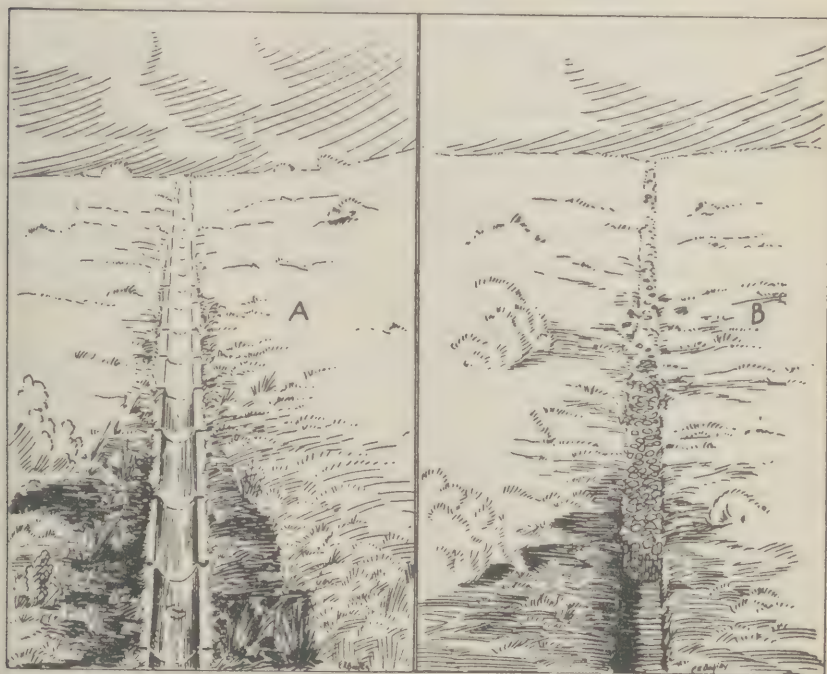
Drainage ditches. A—Precast or sectional concrete lining. B—Rock-filled ditch without tiling.
